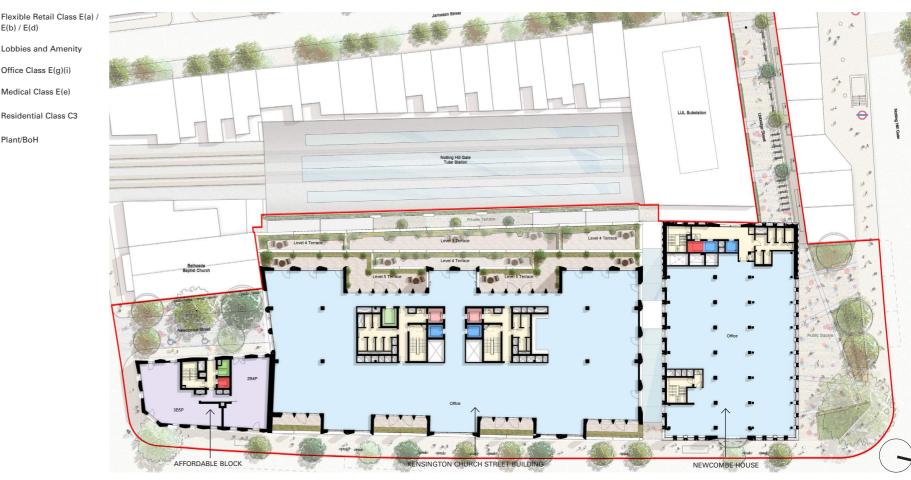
Illustrative Proposed 5th Floor Plan
